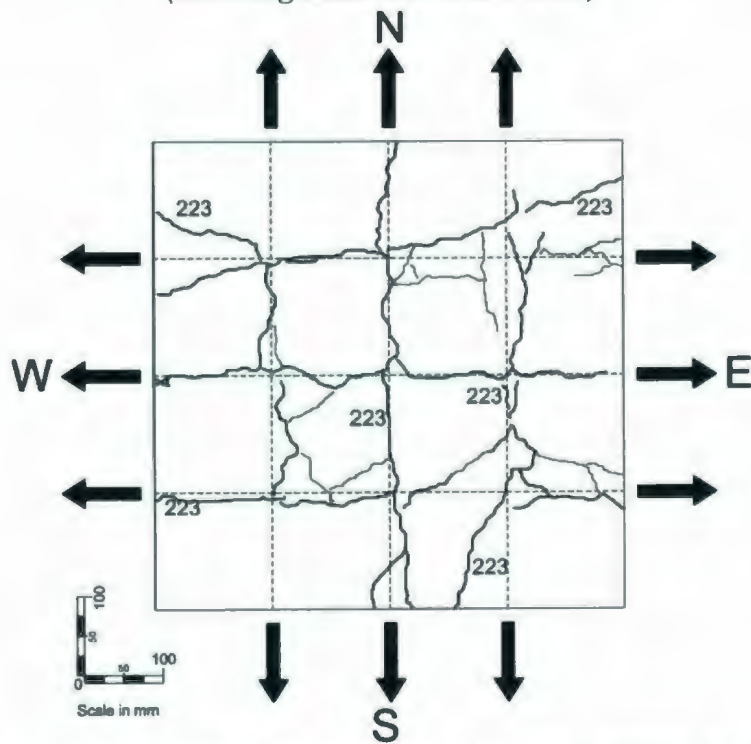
Stabilized crack pattern of panel P9-GHB-13-0.7-2.5
